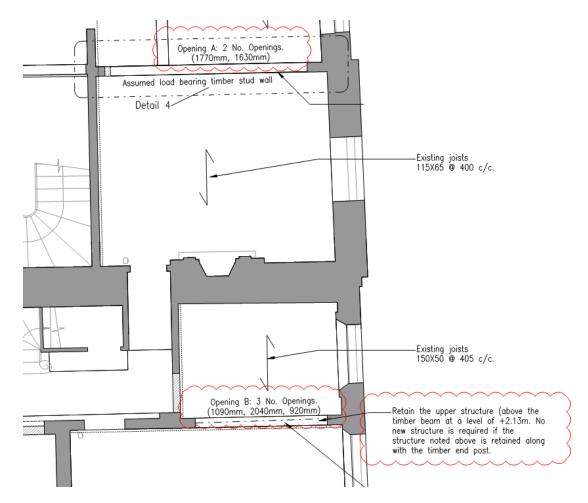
Extract from second floor drawing showing reduction of opening widths minimising structural interventions (refer to Appendix 2, BDP Drawing (20)AP004_WorkInProgress)
